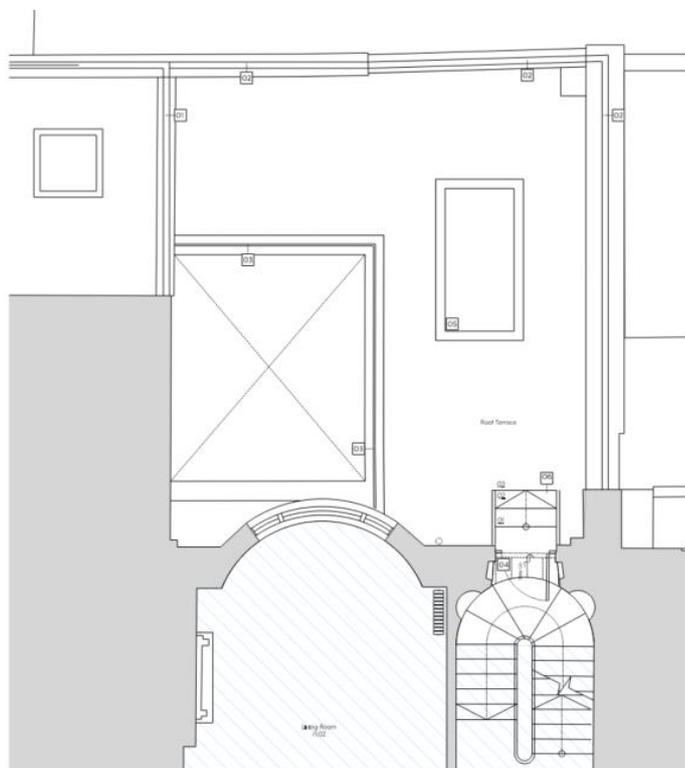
Proposed ground floor plan at rear, with new external door and roof terrace.
